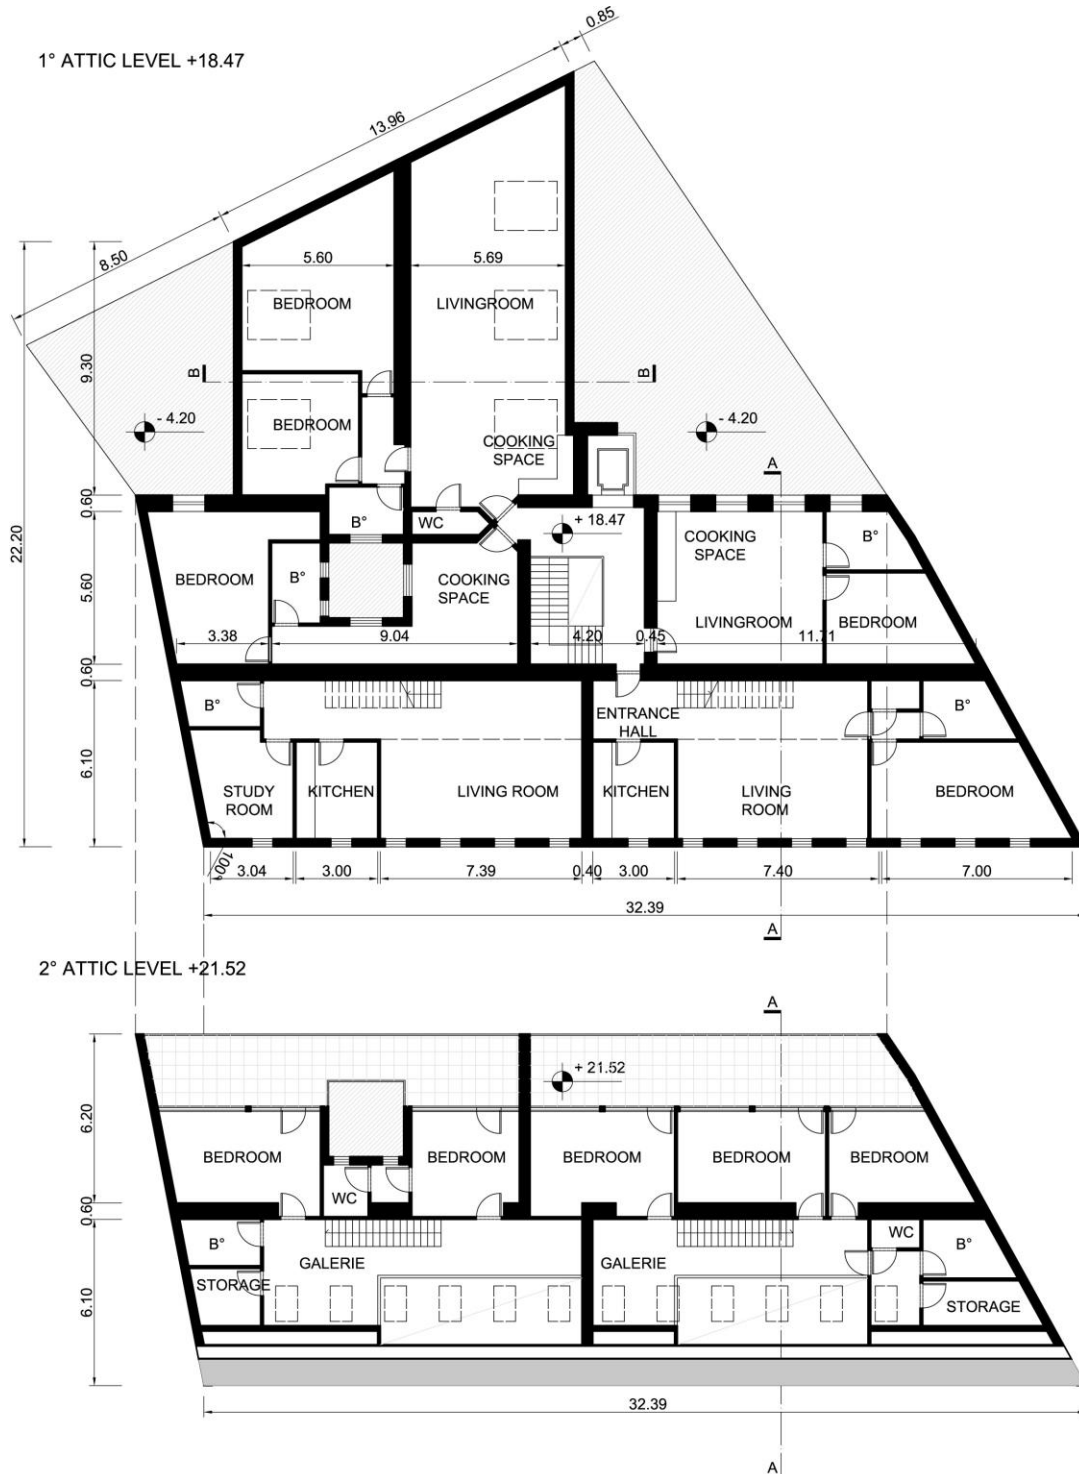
Attic extension in Lehargasse 13, 1060, Vienna. Plans of 1° and 2° attic levels.
